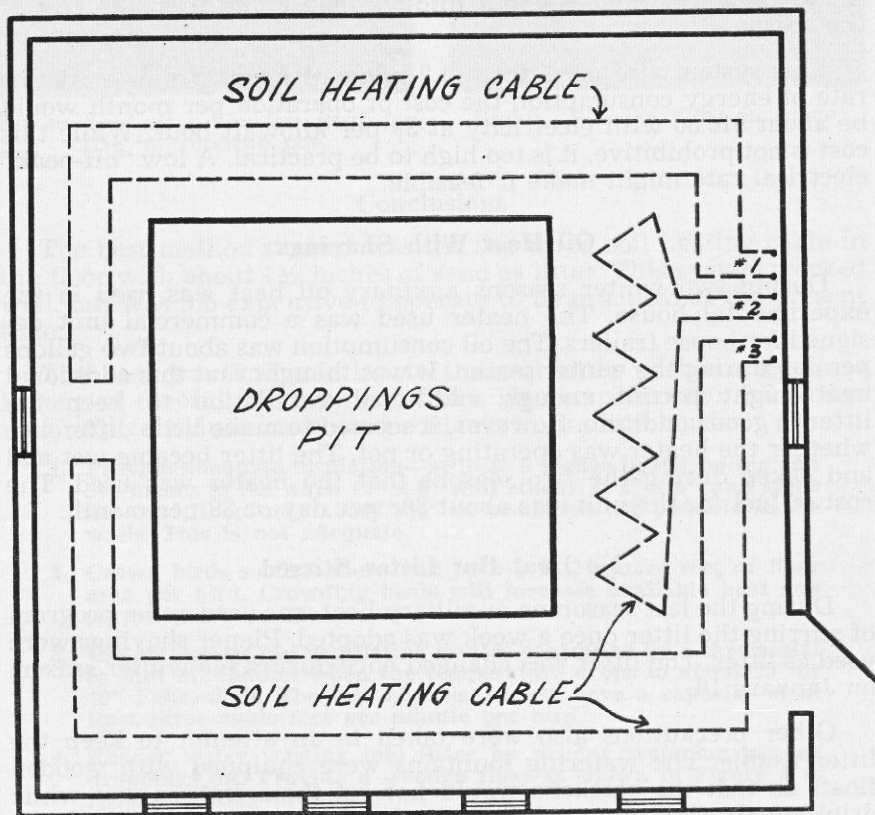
Three 400 watt soil heating cables used in concrete floor to help dry litter.
